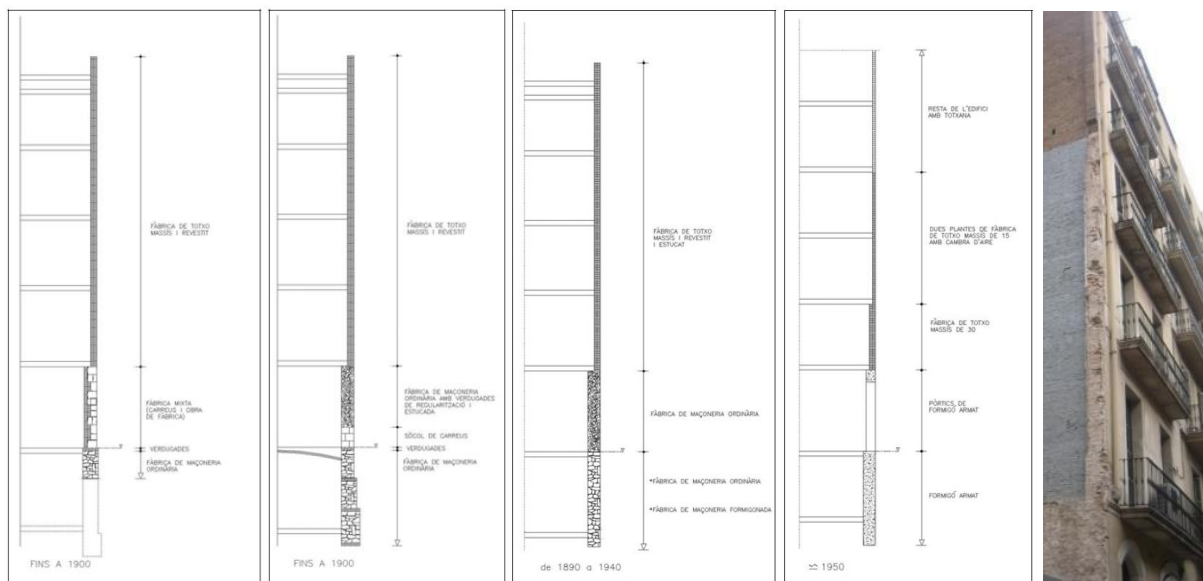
Typical section of the façade wall in different construction periods (from left to right): without basements, with basement with masonry vaults below the ground level, with basement with flooring system on beams below ground level, and with porched system at the base level and different thicknesses and materials of the walls at the upper floor levels. On the right, a photograph with a side view of the front façade of an existing building in the *Eixample* district, in which it can be observed that the slenderness of the load-bearing masonry wall is increasing within the height of the building (Paricio Casademunt, 2001).
